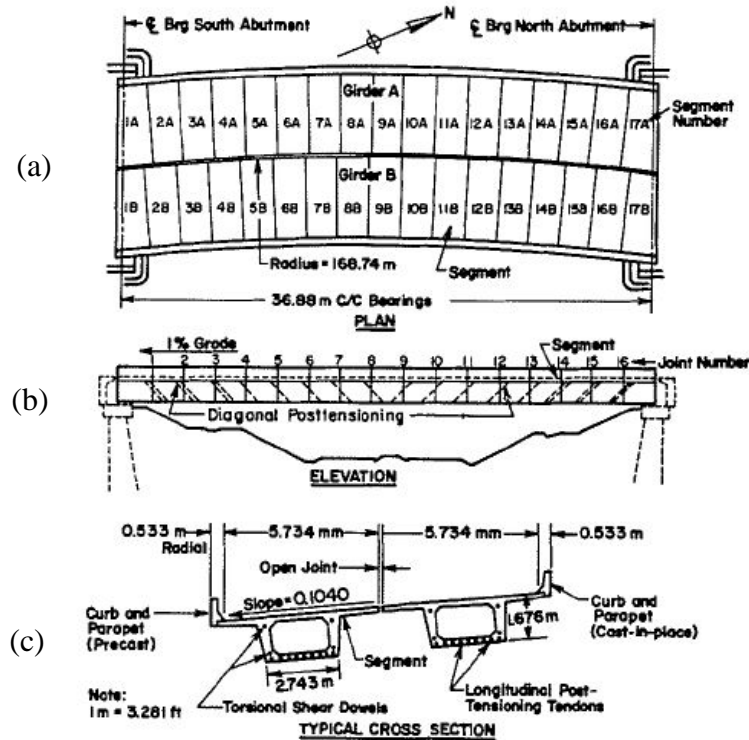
(a) Plan View (b) Elevation View (c) Typical Cross-Section of Test Structure by McClure and West (1983)
